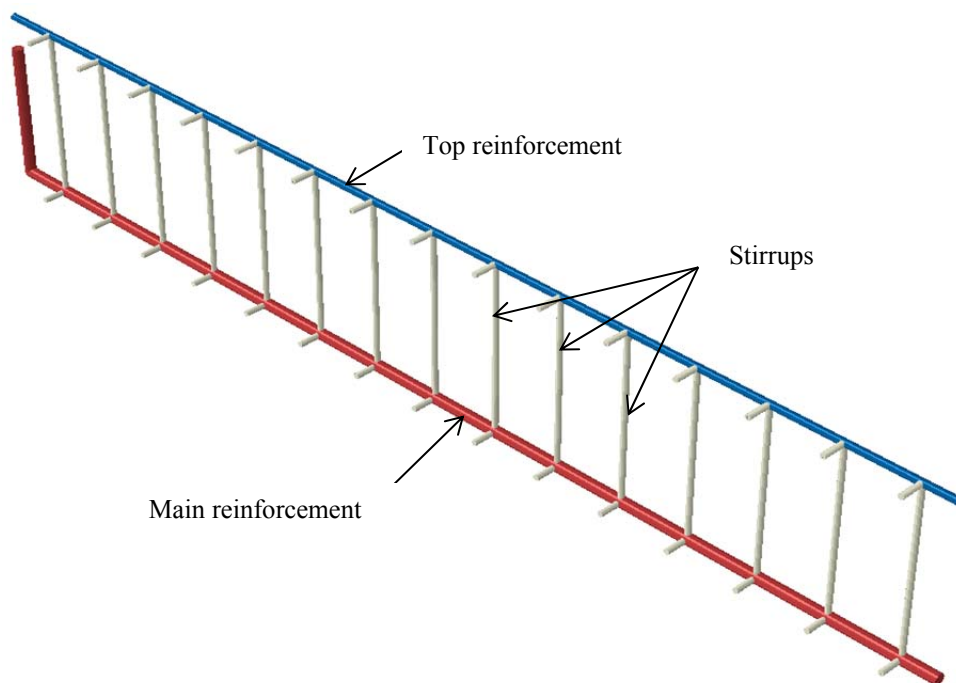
Modeling the steel reinforcement embedded in the concrete beam
